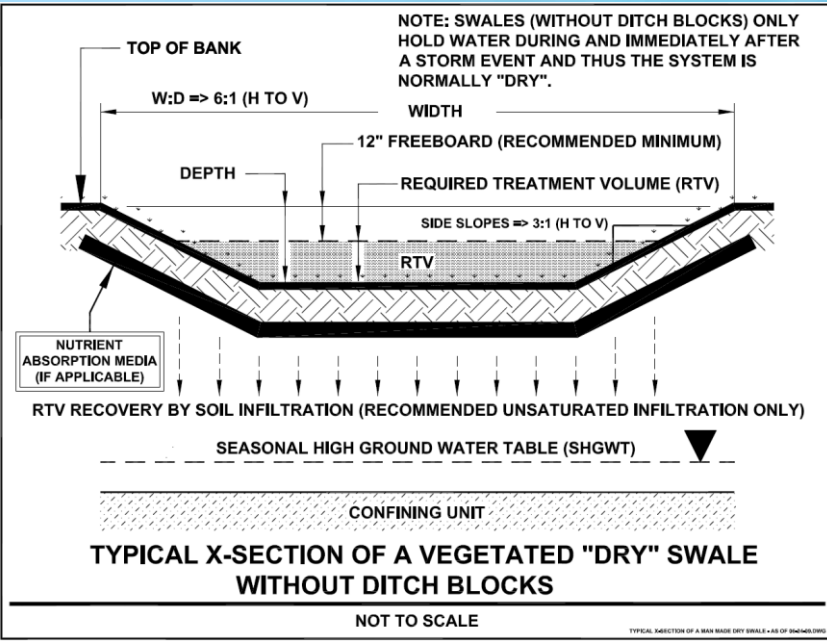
Typical Cross-section of a Vegetated Swale without Swale Blocks
